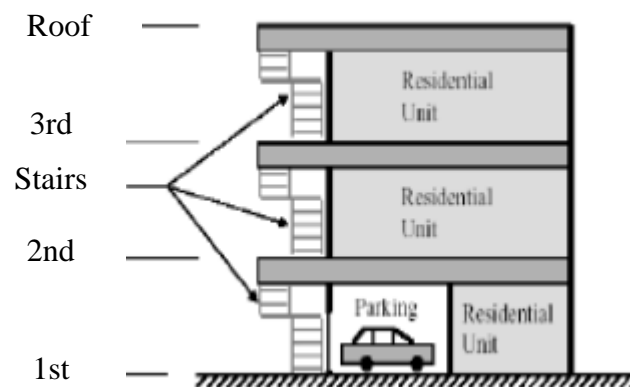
Cross Section of a Soft Story Building. (Hejazi et al., 2011)
